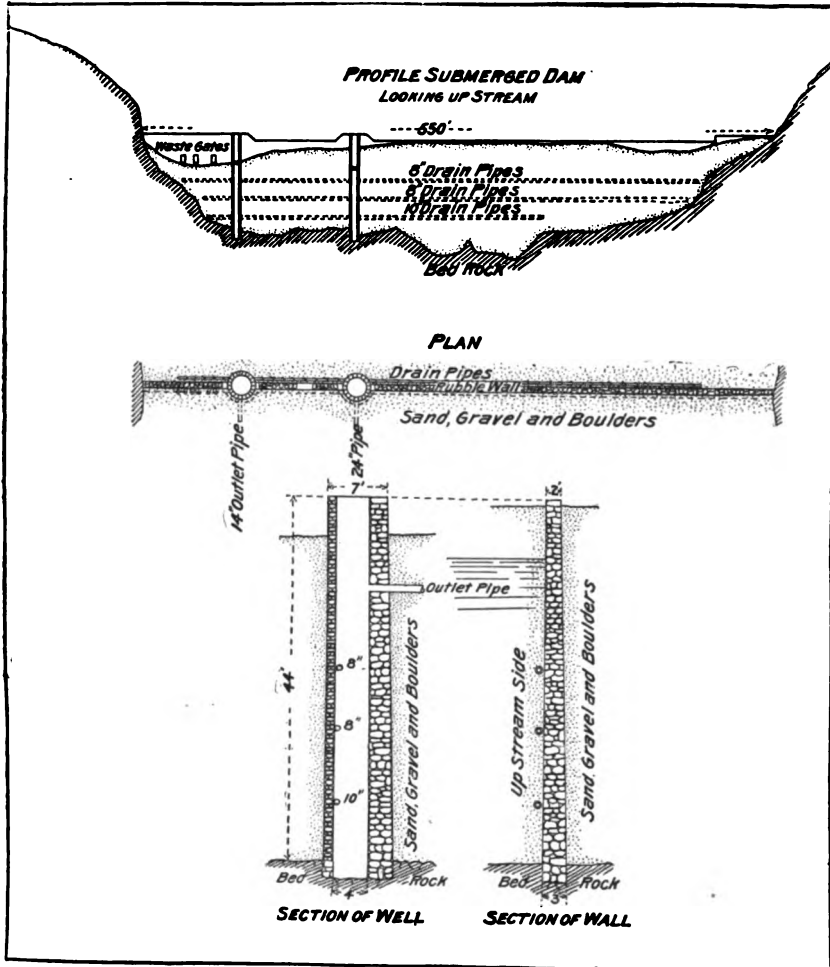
PLAN AND PROFILE OF PACOIMA DAM.
